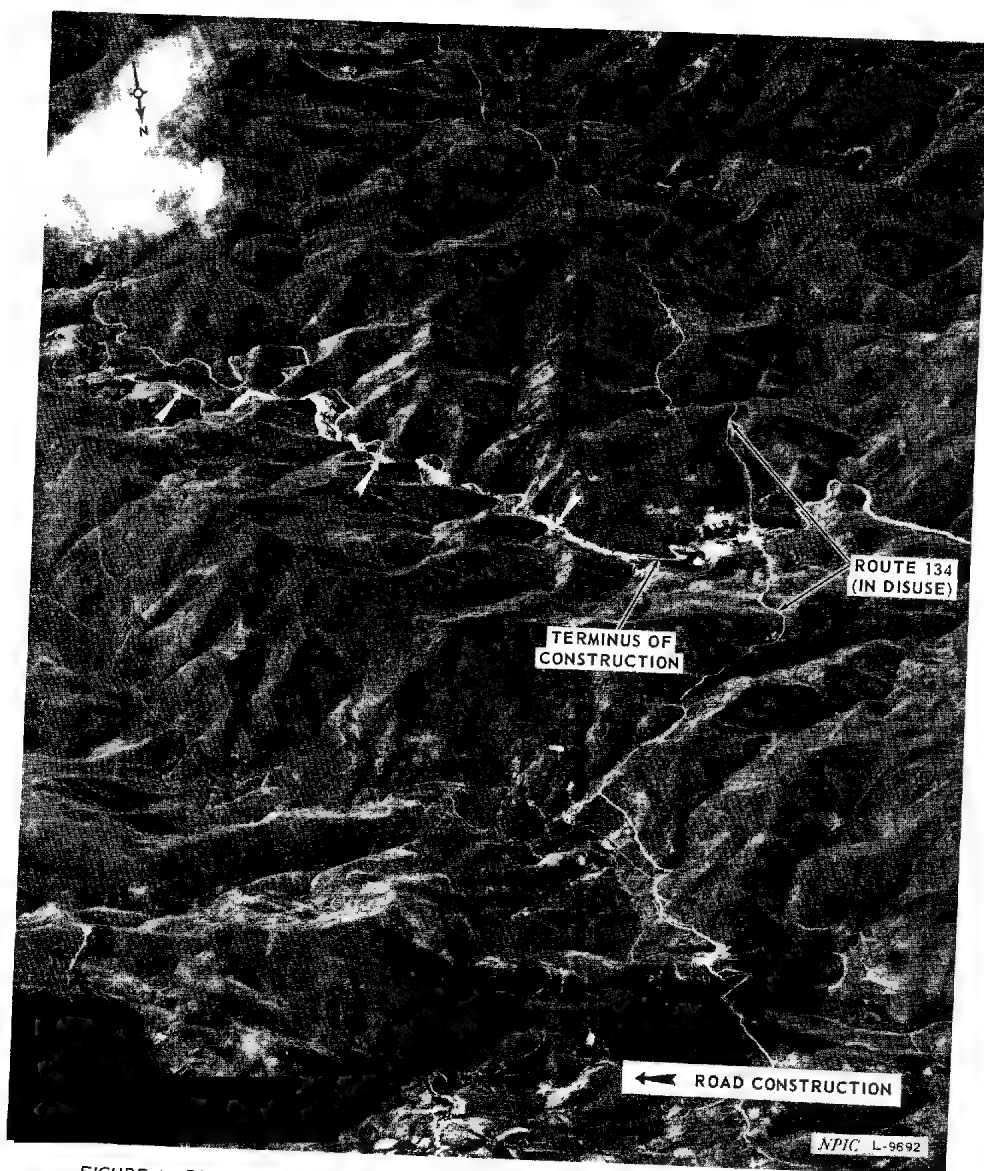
CONTINUED ROAD CONSTRUCTION, ROUTES 132/134 AREA, NORTH VIETNAM
